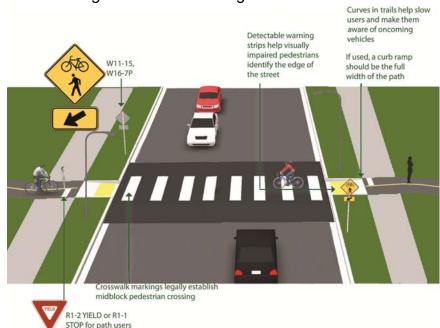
H – Mid-block non-signalized trail crossing of a local/residential street.
